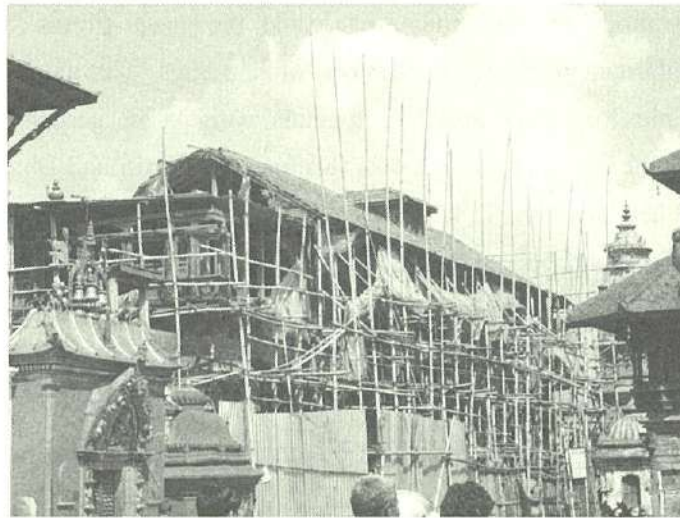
Wooden structures in the 55-Windowed Palace (currently under renovation), Bhaktapur
